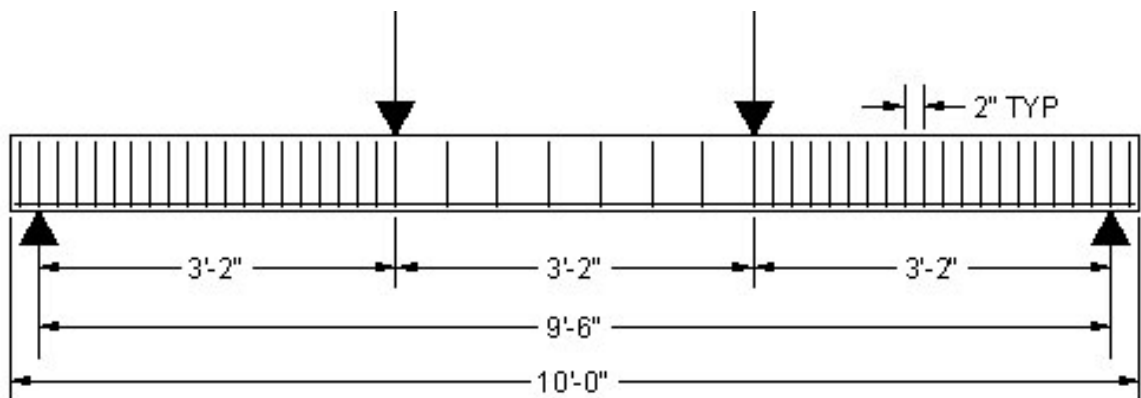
Beam Dimensions, Shear Reinforcement, and Loading.
